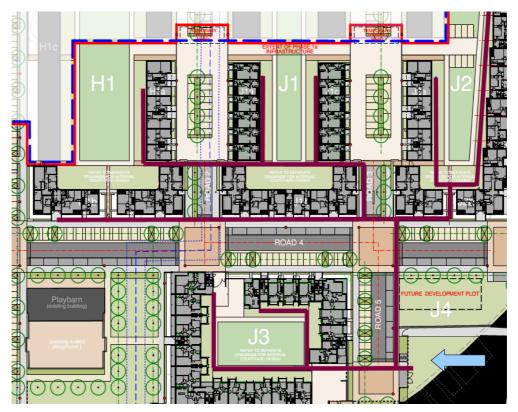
Laurieston Development Plan Drawing and Suggested Pipe Routing (PPA, 2011)
